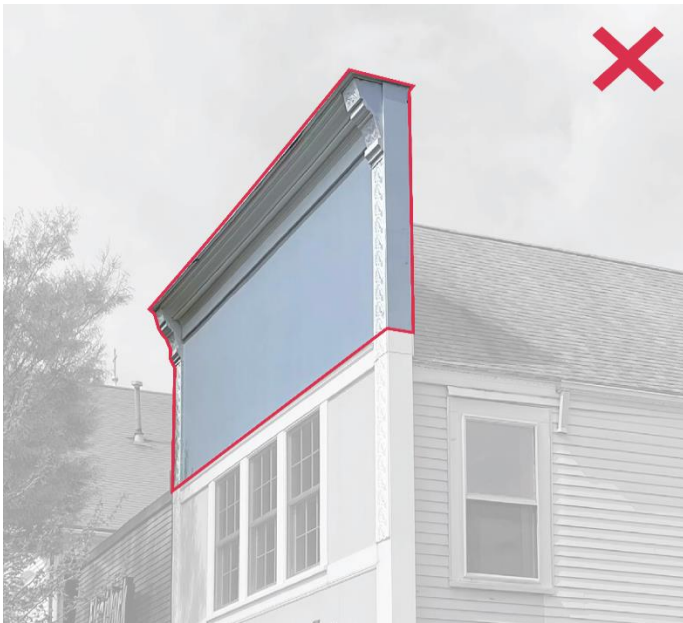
Example of a false front (a facade that extends above the roof line to form a tall parapet).
